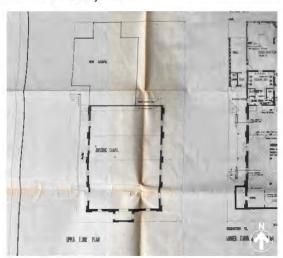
Proposed Upper Floor Plan, dated July 1972, by Stafford, Moor & Farrington Source: Church of Christ Archives.
